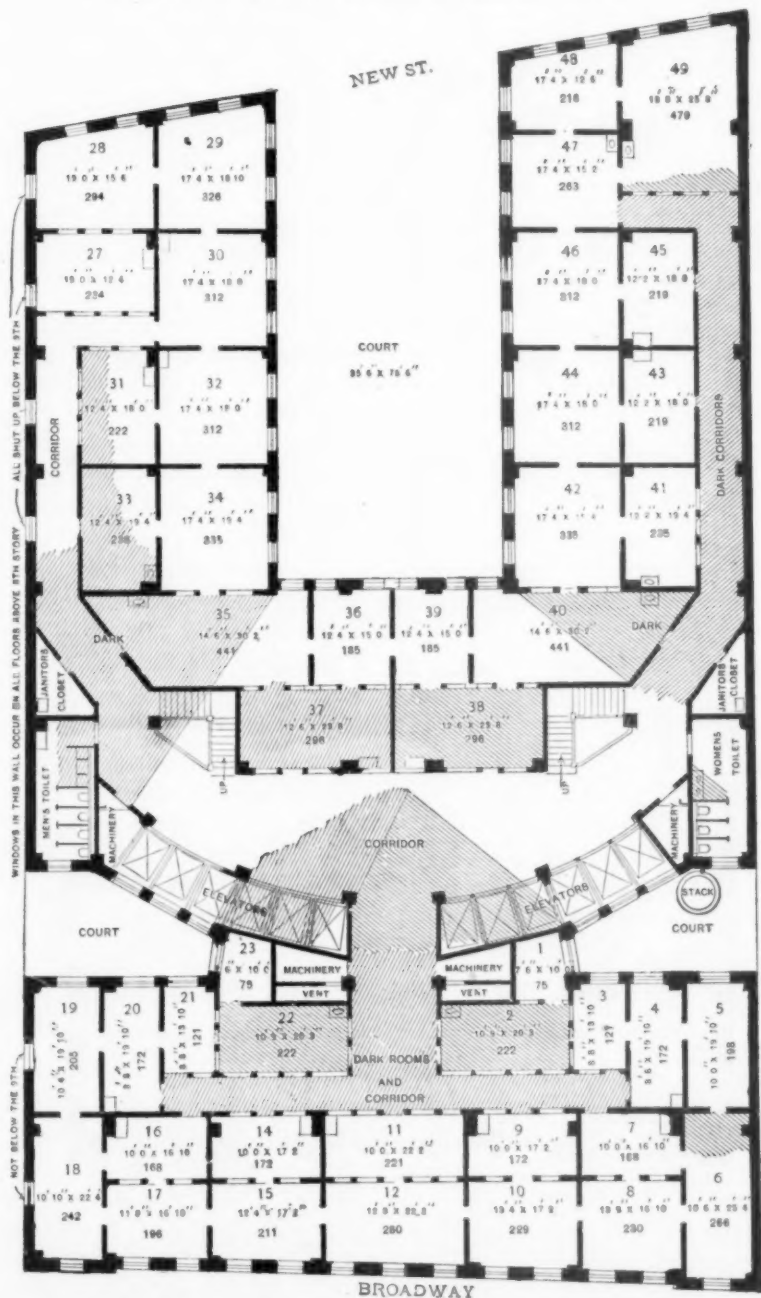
FORTY-TWO BROADWAY. TYPICAL FLOOR PLAN.
